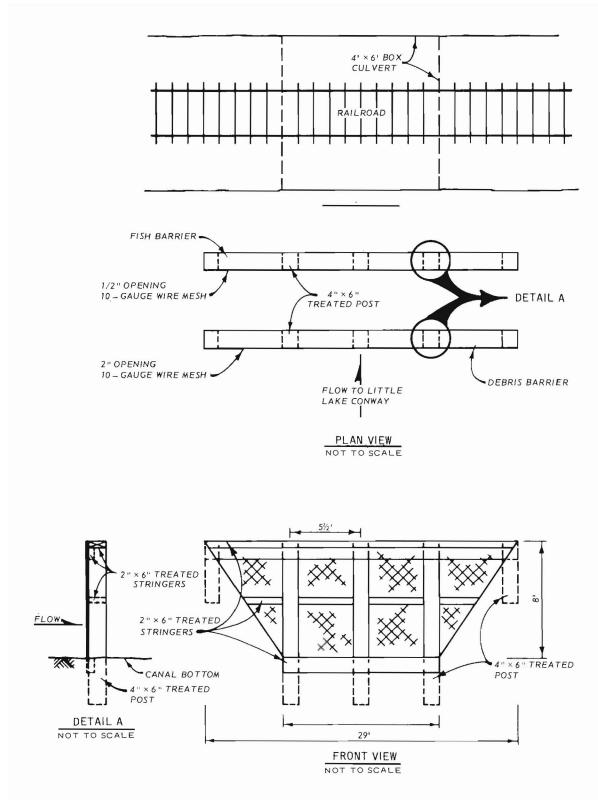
Barrier system at the inlet canal from Lake Jessamine (structure 2)
